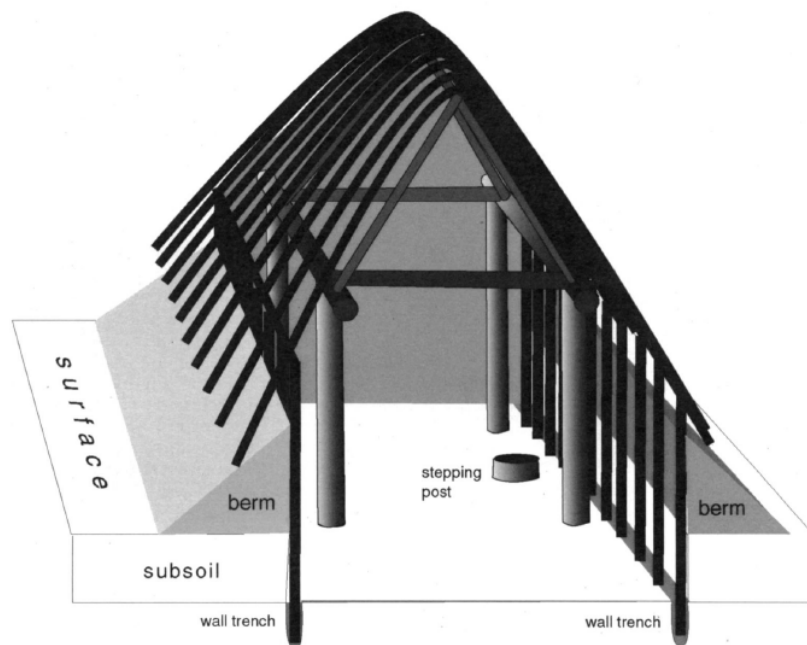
Cutaway view of a projected wall trench early Mississippian house (Pauketat and Alt 2011, 119)
